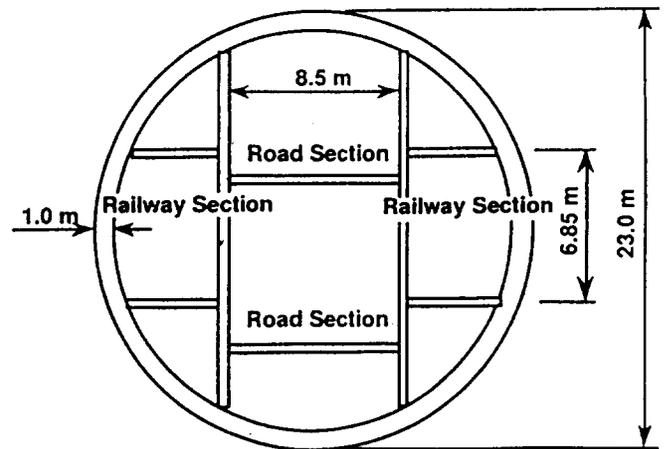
Dimensions of the cross-section for proposed Uchiura Bay SFT crossing.
